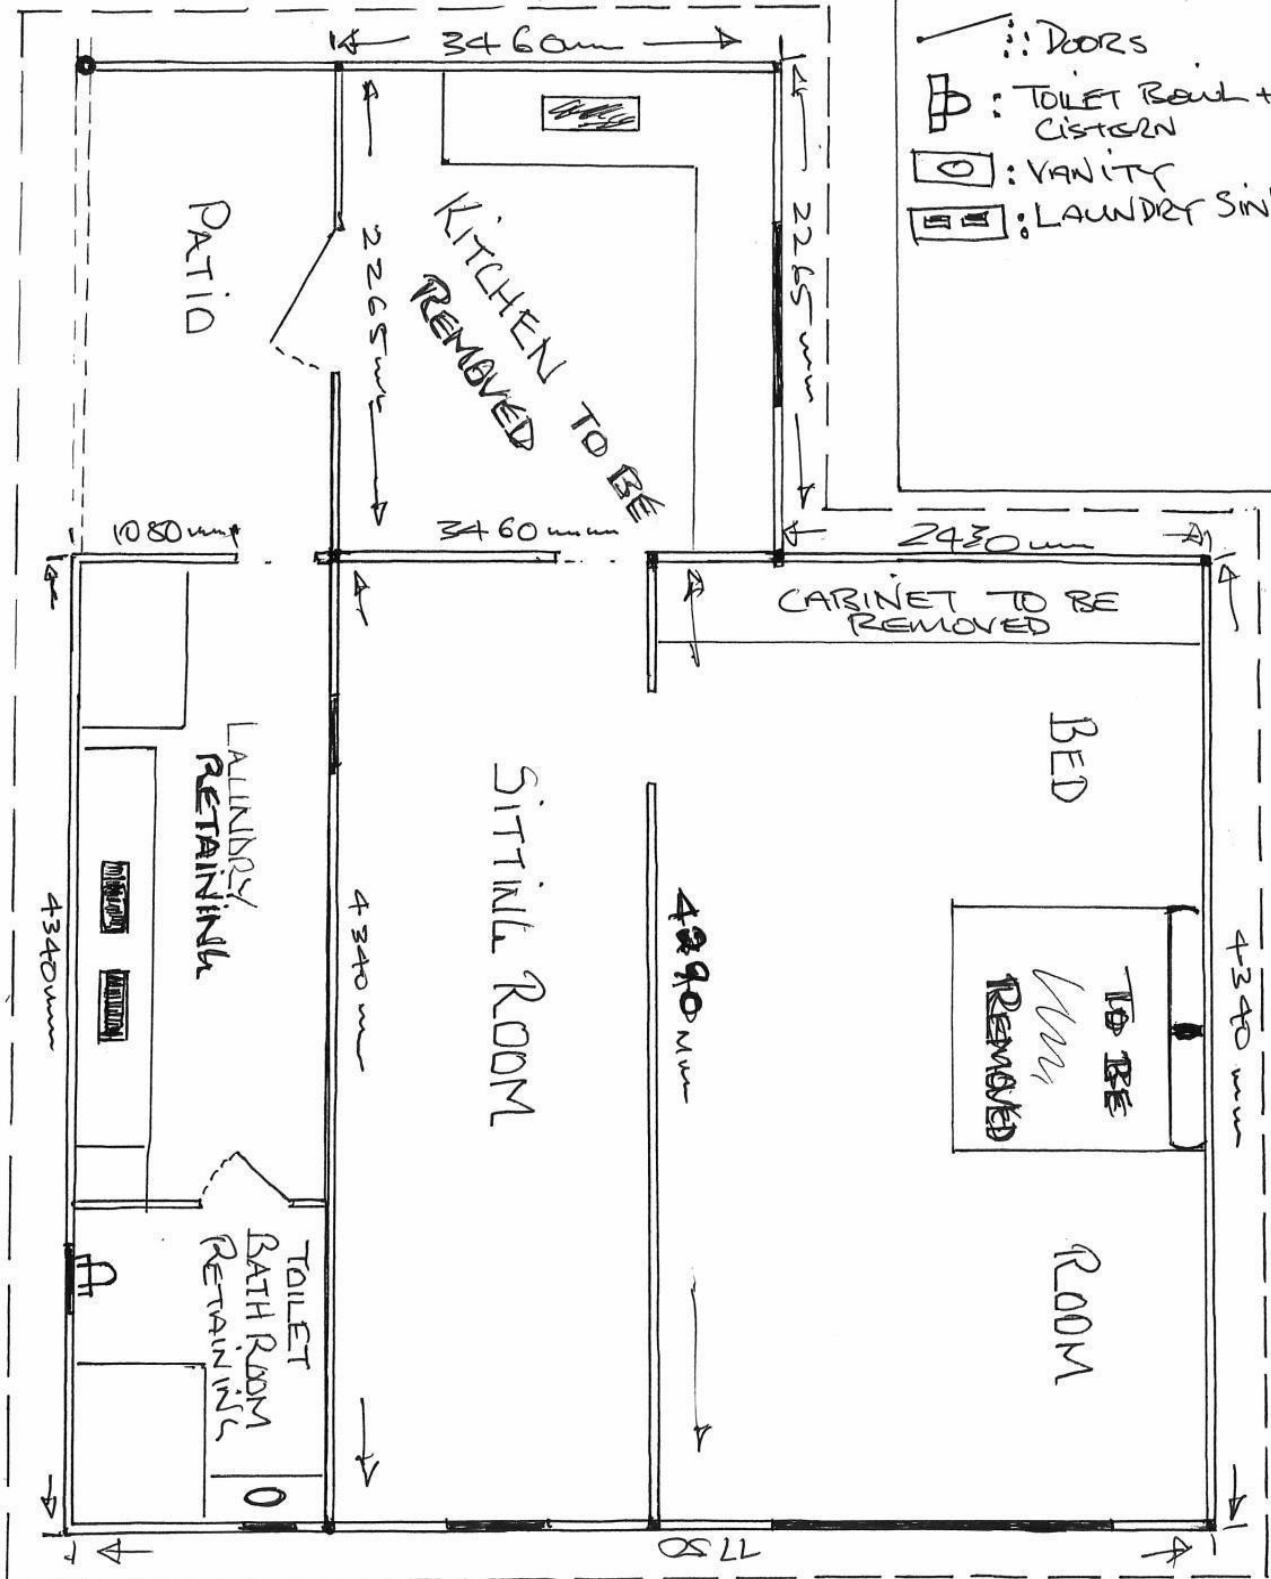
Existing Cottage Floor Plan with proposed decommission works for use as storage shed
